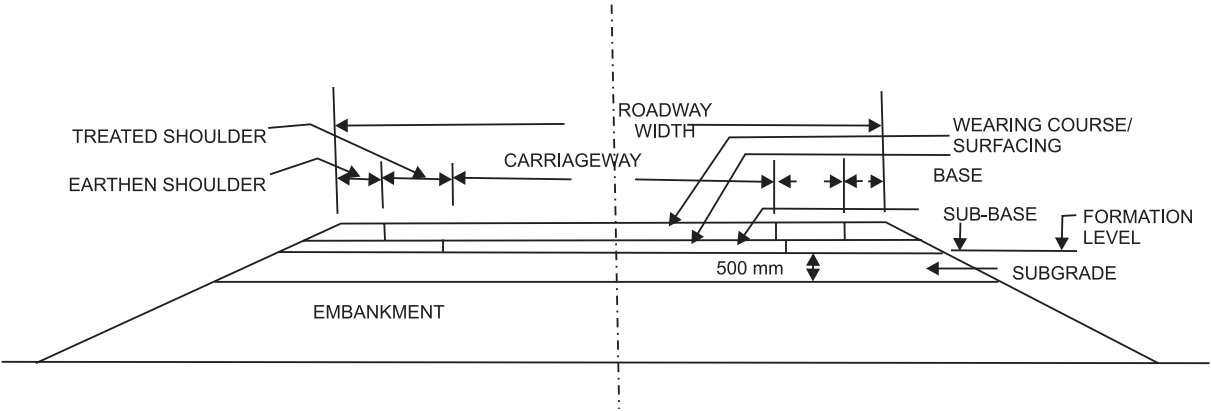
Terms Used in the Specifications to Describe Road Cross-Section Elements with a Flexible Pavement
